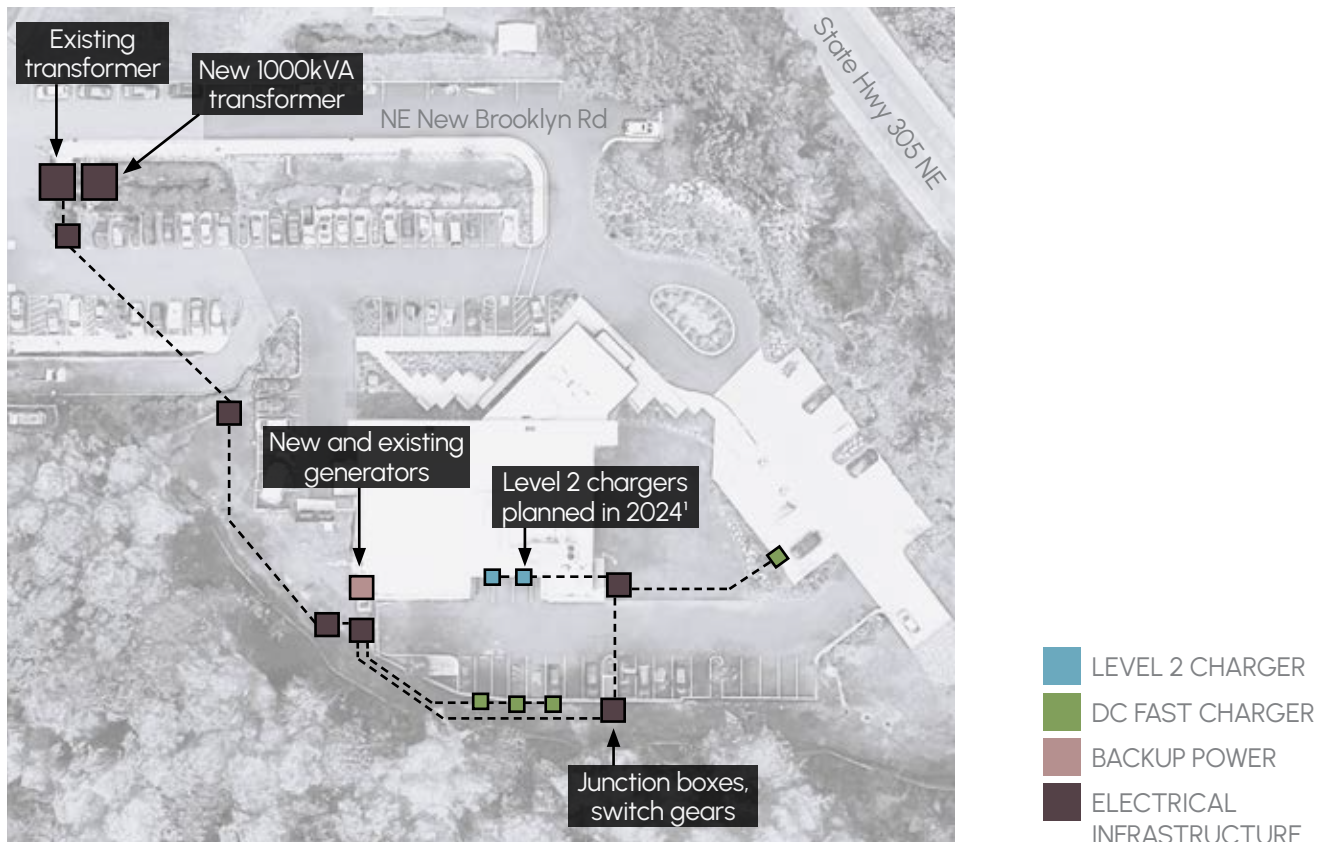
Proposed Justice Center electrical equipment and infrastructure layout
